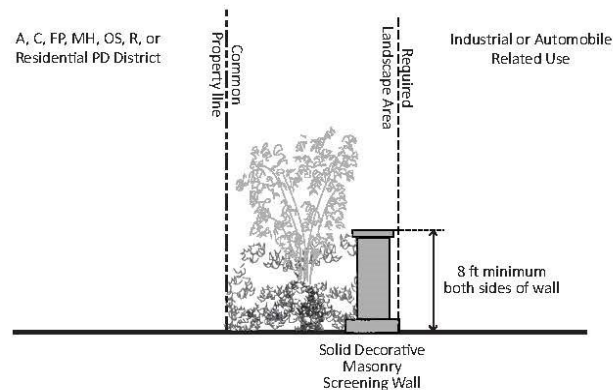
H: WALLS BETWEEN INDUSTRIAL AND OTHER DISTRICTS
